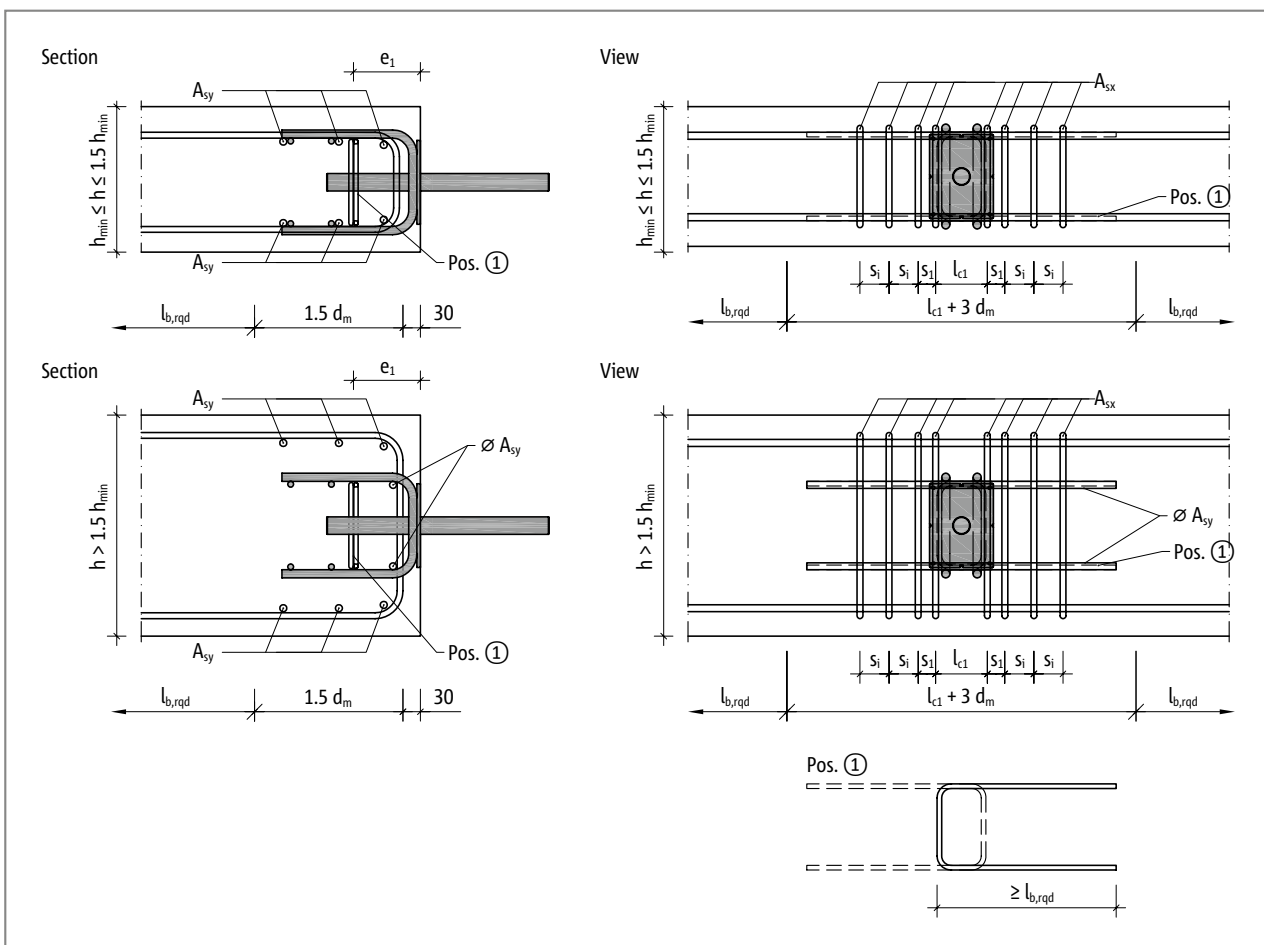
Schöck Dorn type SLD-Q 40 to SLD-Q 80: On-site reinforcement
